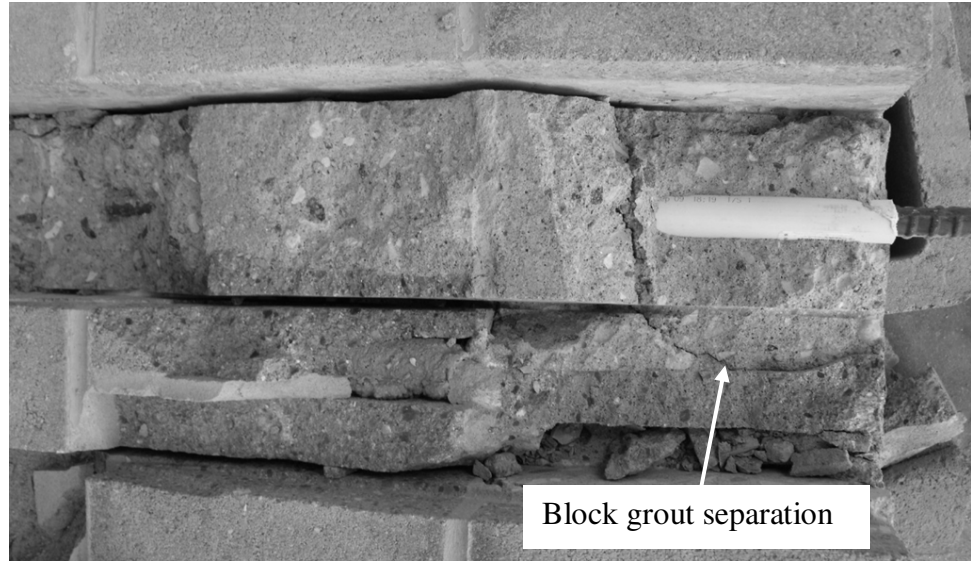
Bar pullout and splitting crack - Specimen CP-3.
